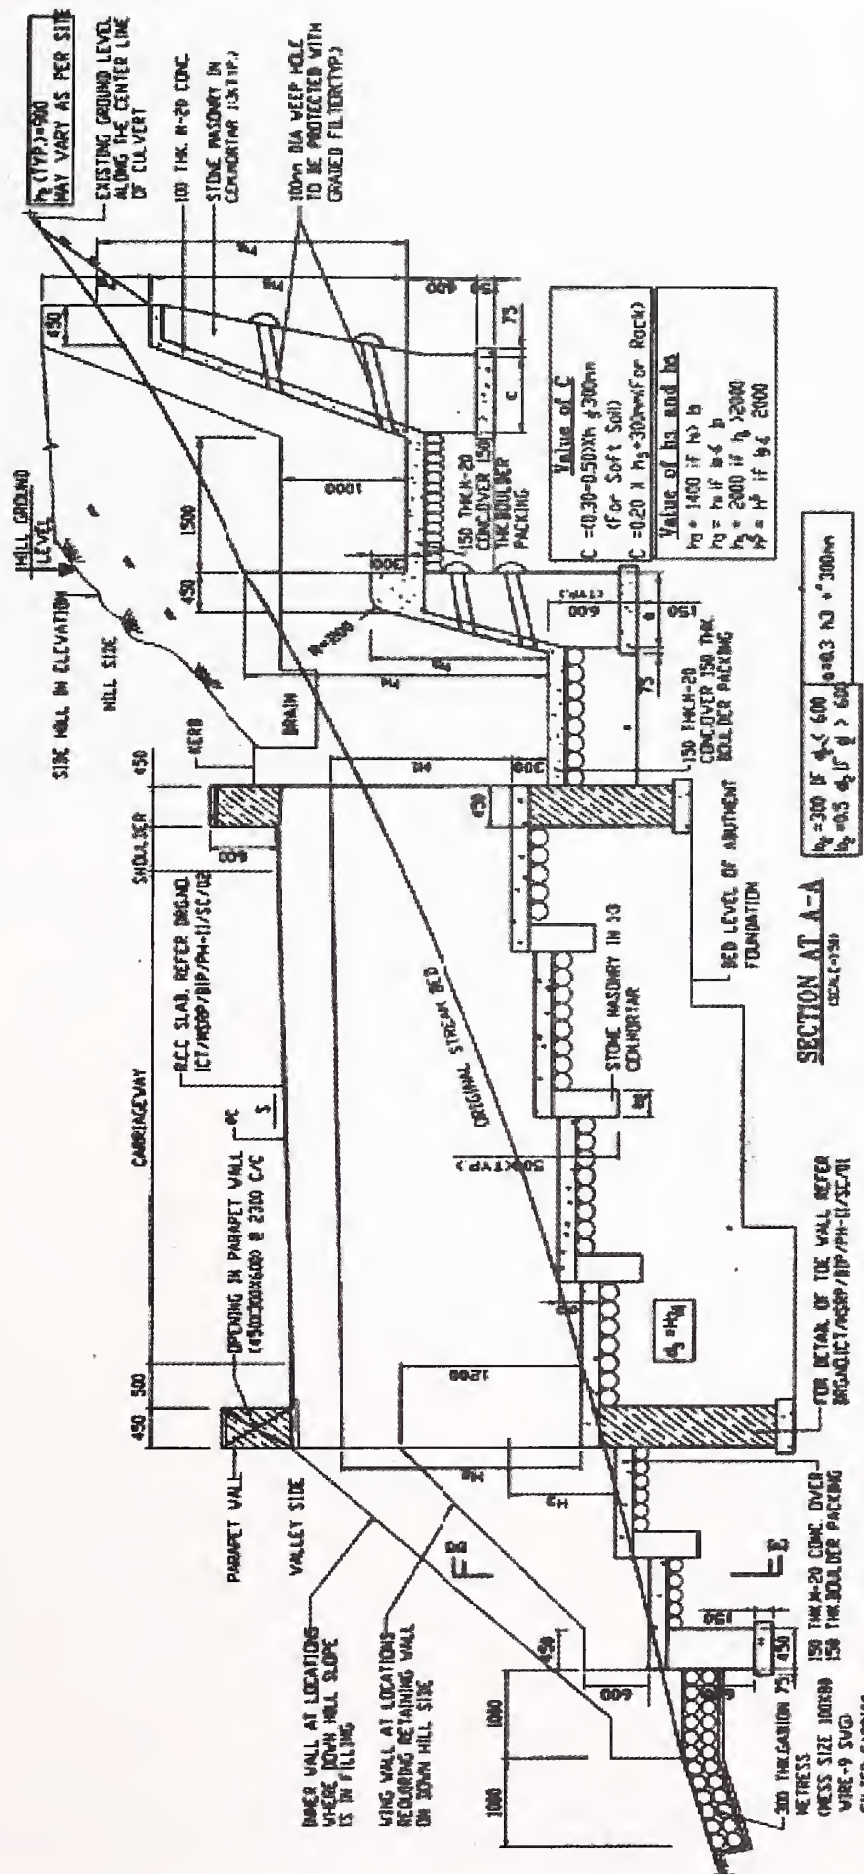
Sectional Elevation of Typical Pipe Culvert with Improved Inlet in a Hilly Terrain
